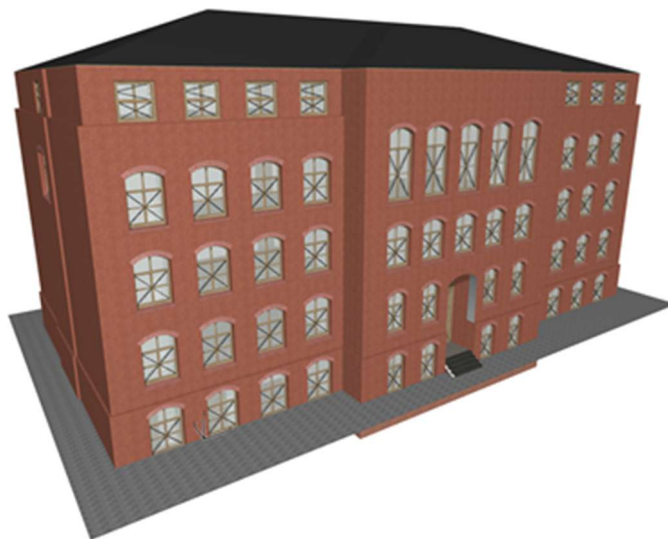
Model of the building made using, among other things, a point cloud obtained from photogrammetry, created in Archicad (without modelling details on the façade yet)
